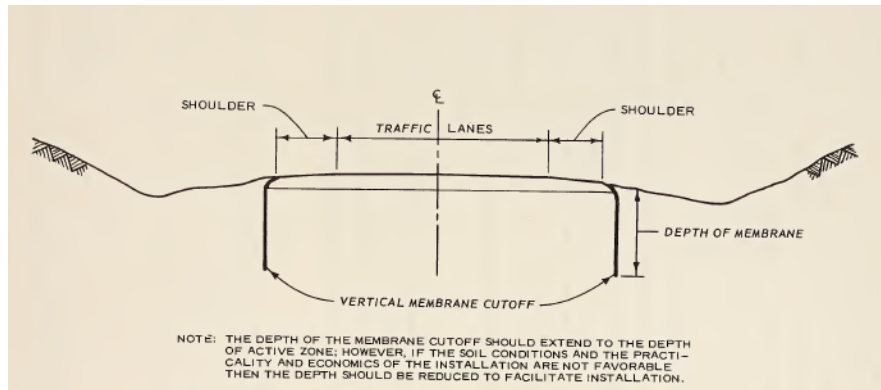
Typical Vertical Moisture Barrier Cross-Section (Snethen 1979)
